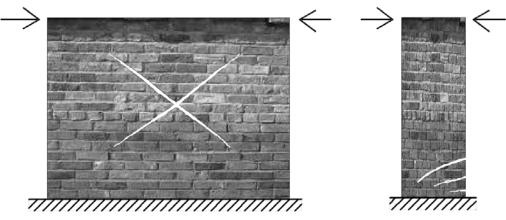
Wall cracking from horizontal actions [1]
